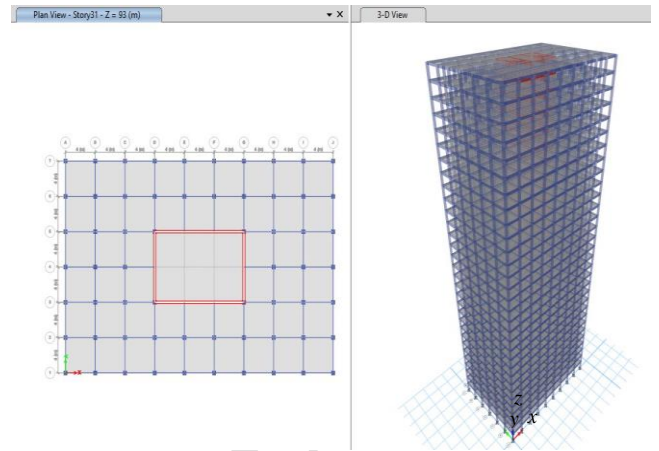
Model 6-Buildings with shear wall located at the center as core
